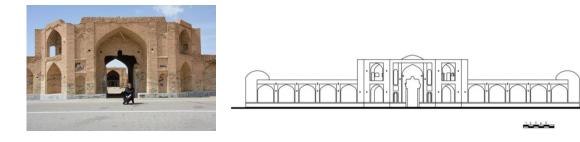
and 7 Elevation and the Entrance doorway (source: Authors)
